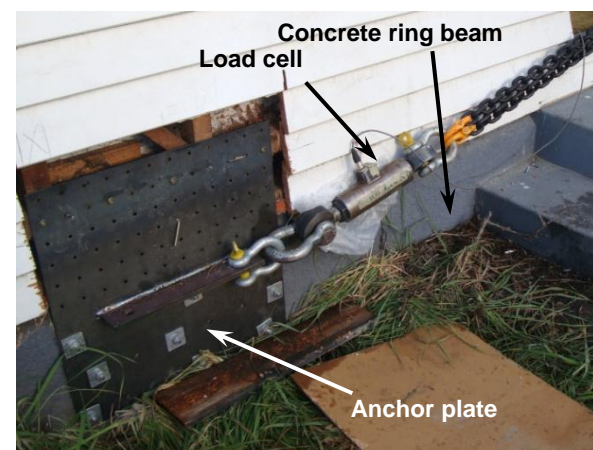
Anchor plate at Bexley Rd screwed to wall and subfloor and dyna-bolted to foundation. Photo: L. Holt
